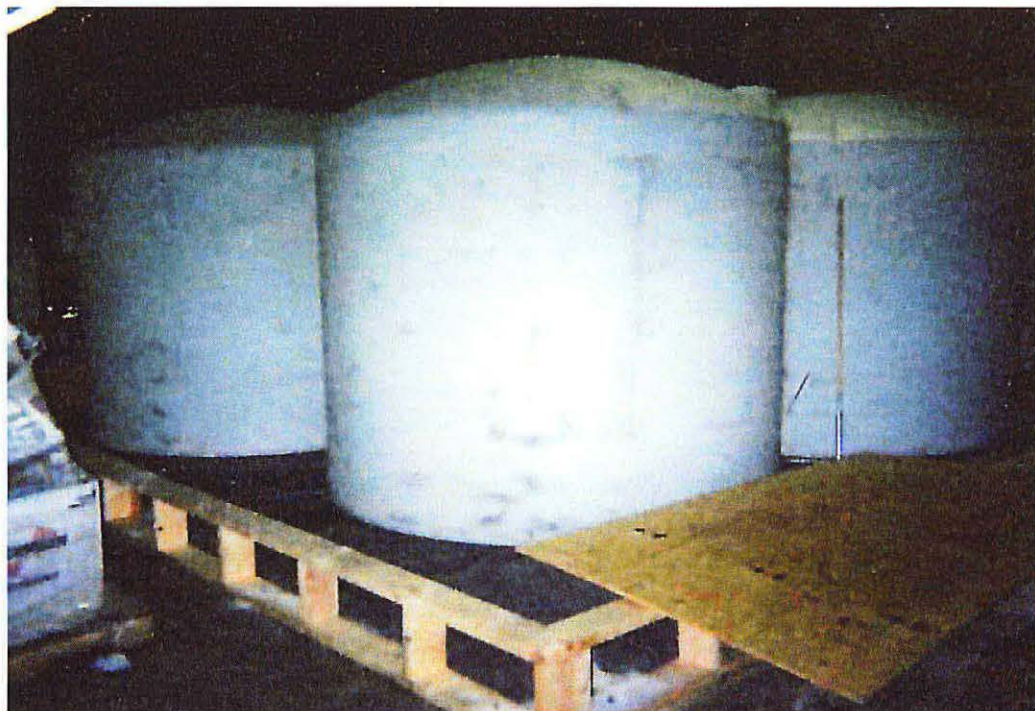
Looking southwest, picture of spill containment wall construction surrounding the four 2,500-gallon storage tanks. The 20-mil polyethylene liner is visible on the floor.
